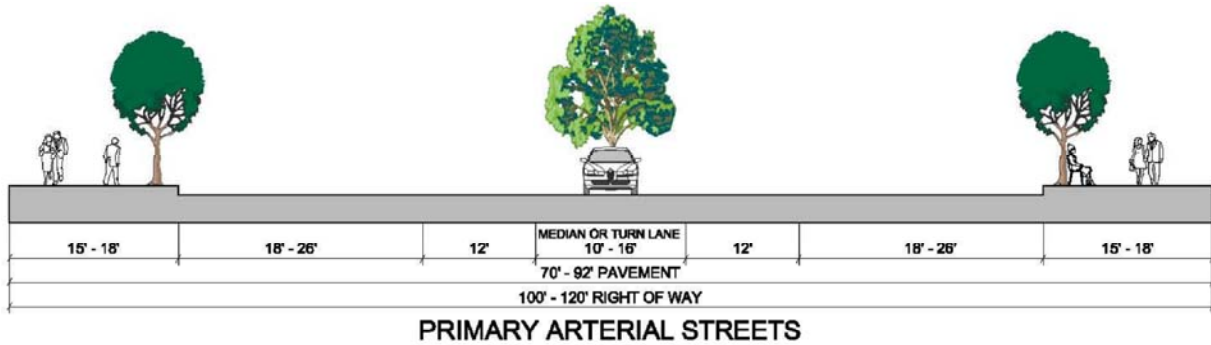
CITY OF MONROVIA GENERAL PLAN ROADWAY CROSS-SECTIONS
